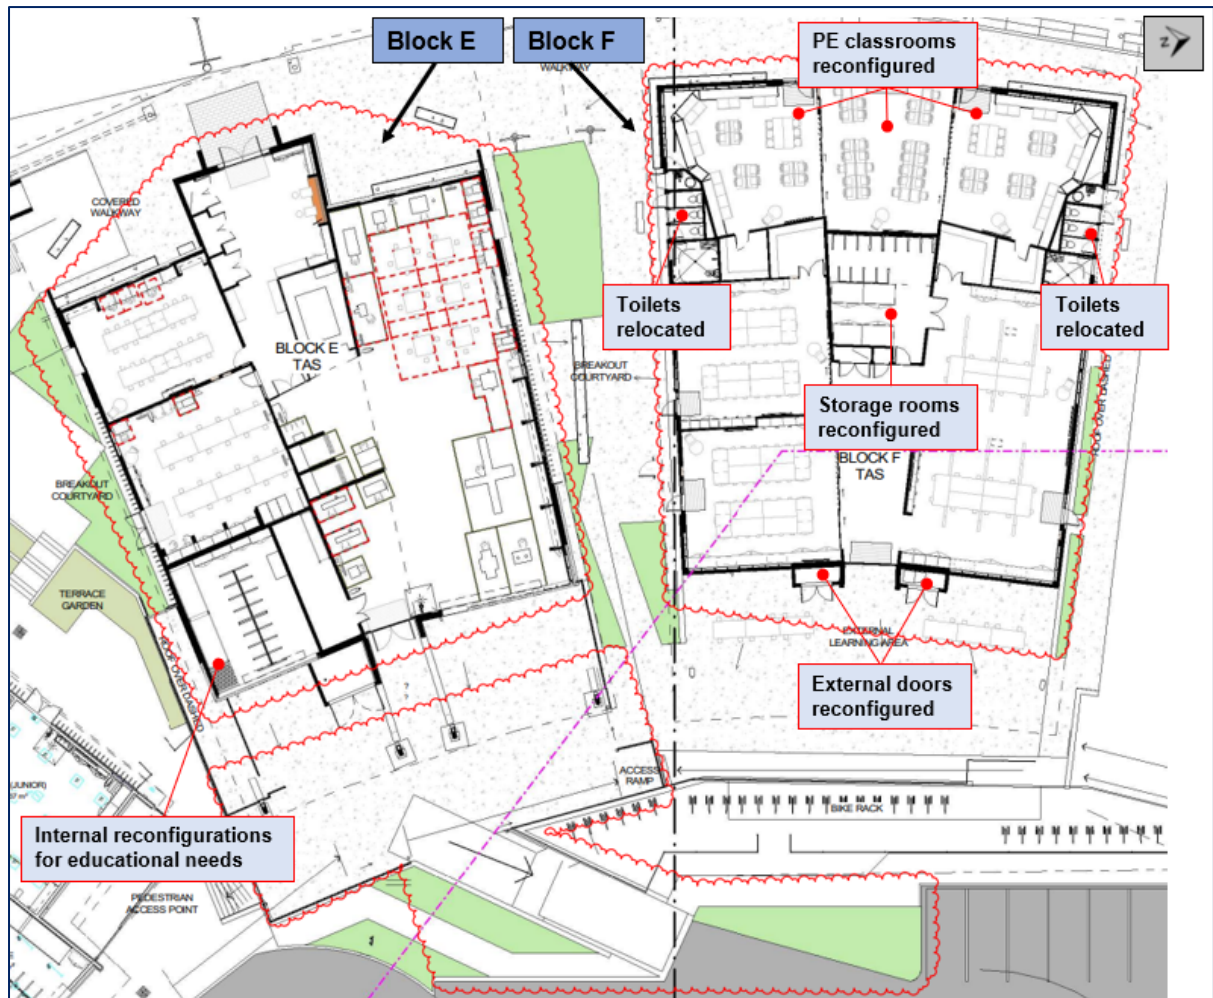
| Proposed Block E and Block F amendments – ground floor (Source: Applicant’s Modification Report)
